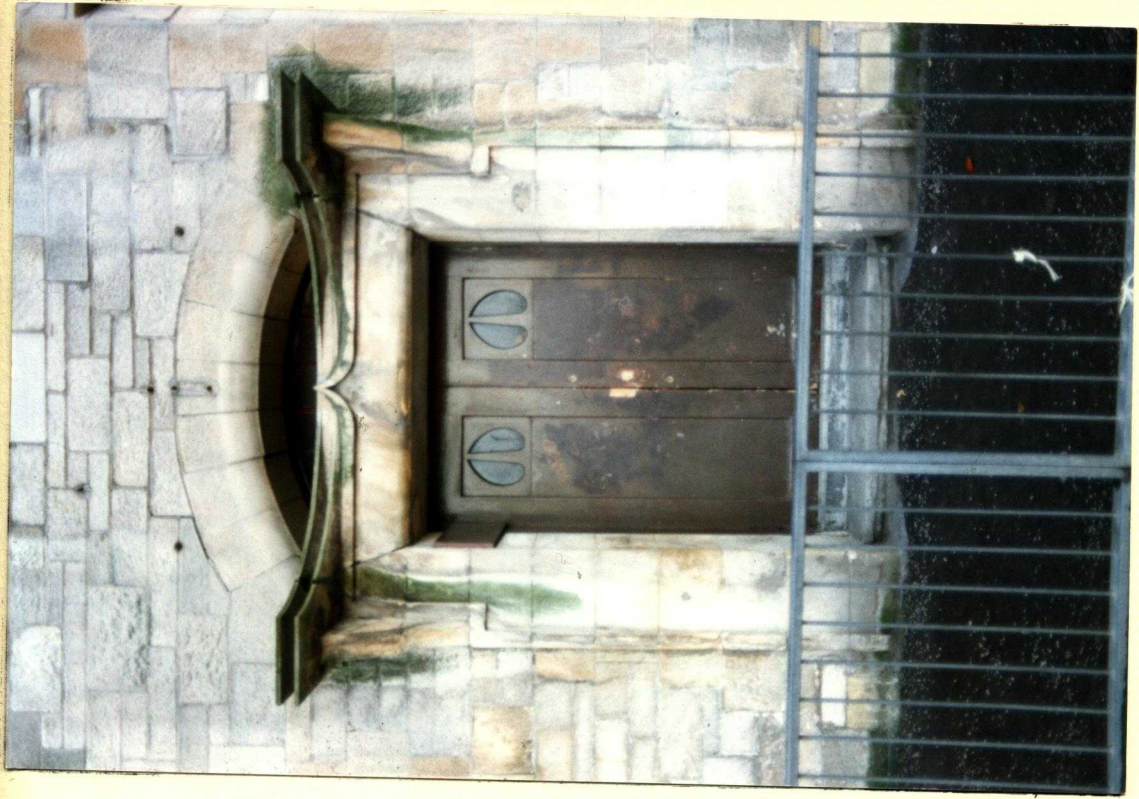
STONEWORK DETAILS AT ENTRANCE
